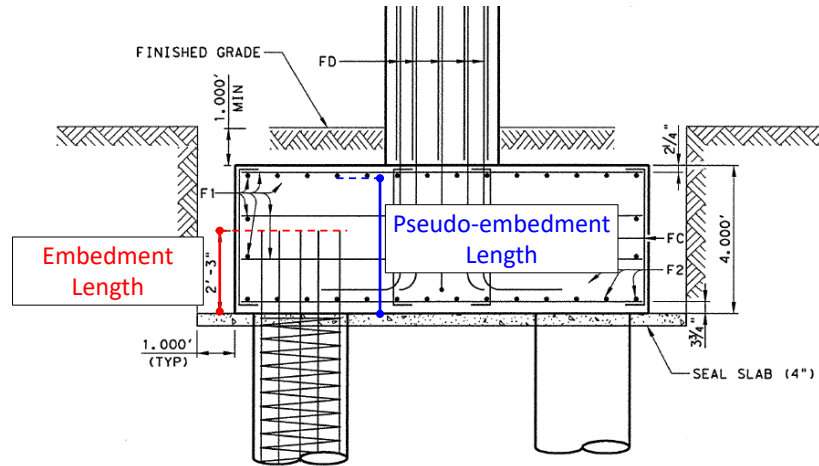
Definition of pseudo-embedment length of drilled shaft reinforcement in a TxDOT footing plan
